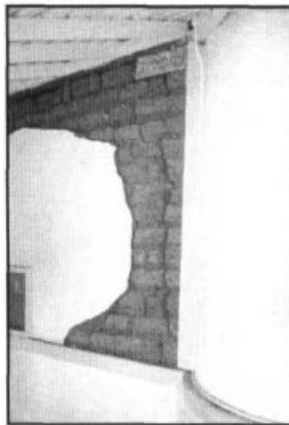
Vertical crack on the east side of the northeast corner of the second floor, similar to the cracks on the south end of this wall. A crack of this nature develops because of the tension in the adobe that developed when the south wall pulled away from the perpendicular wall.
